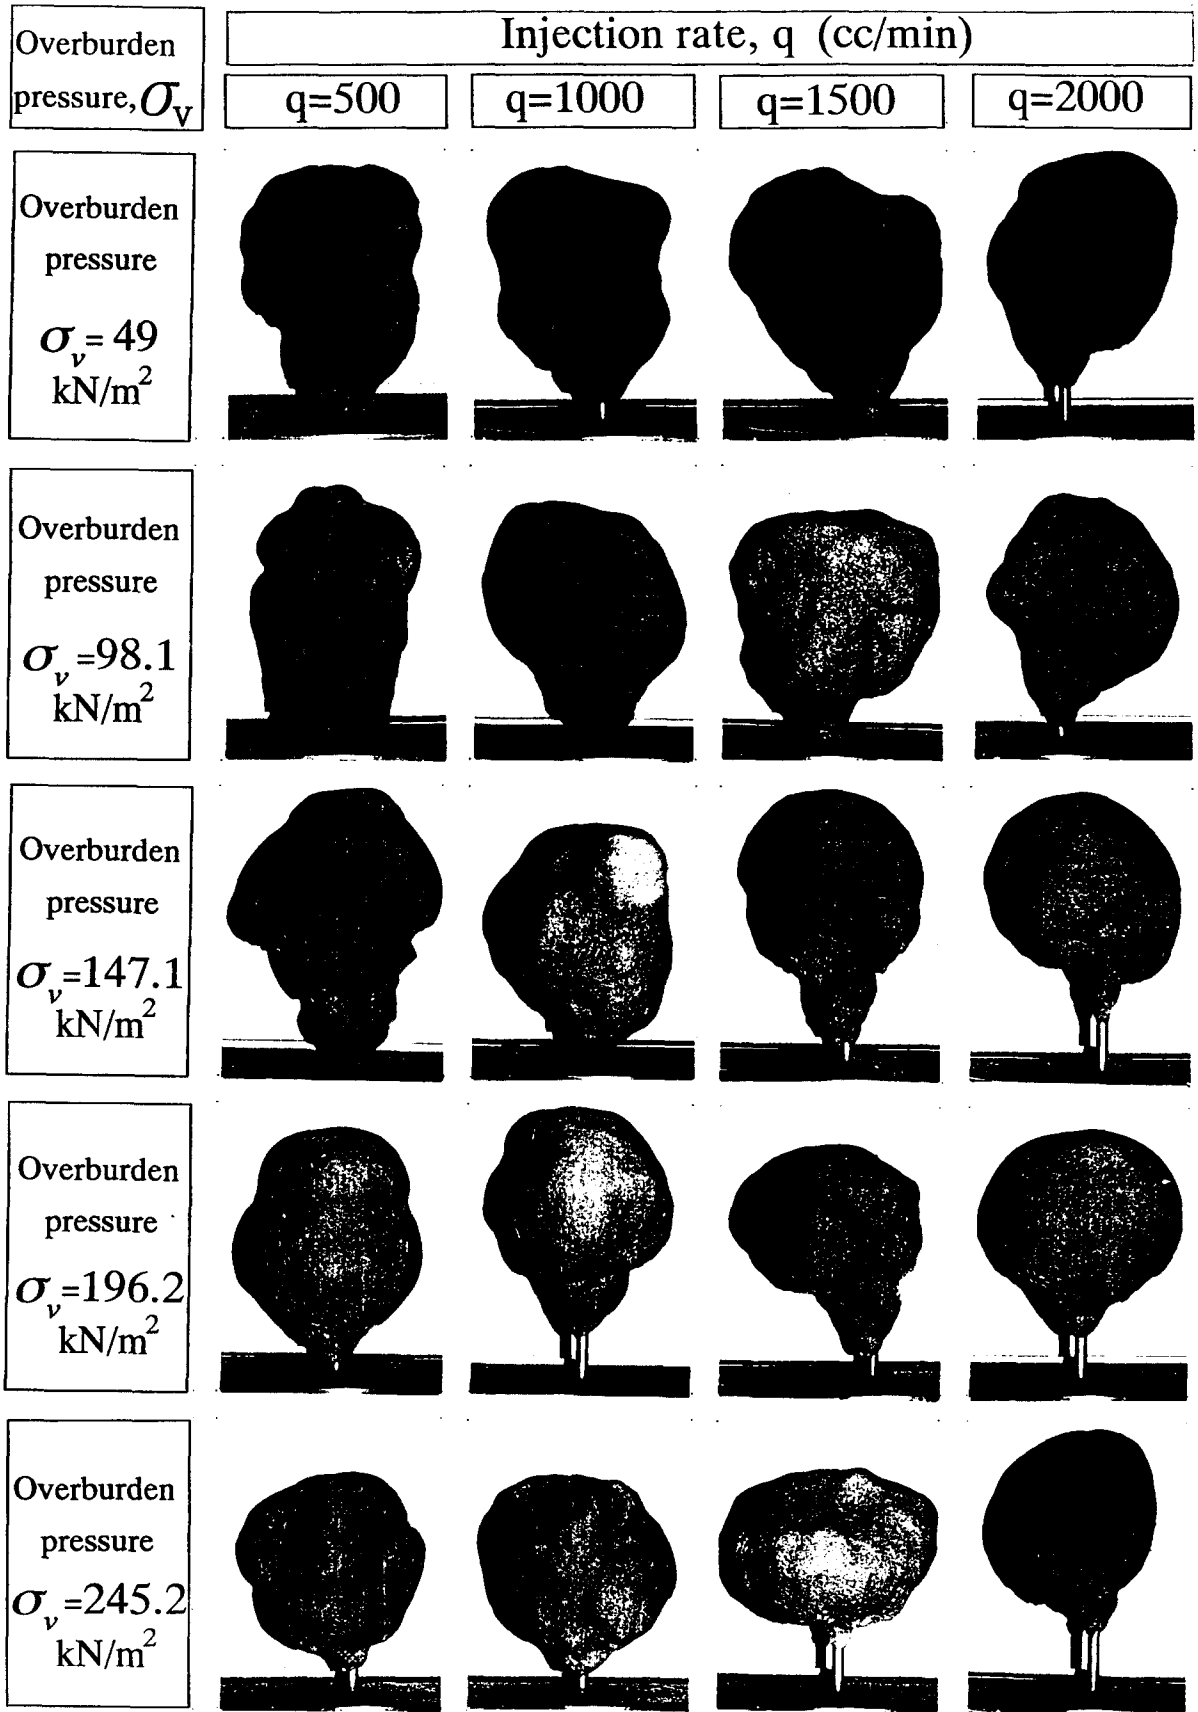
Consolidated shape by grouting conditions on short gelling time grouts (Dense specimens)
